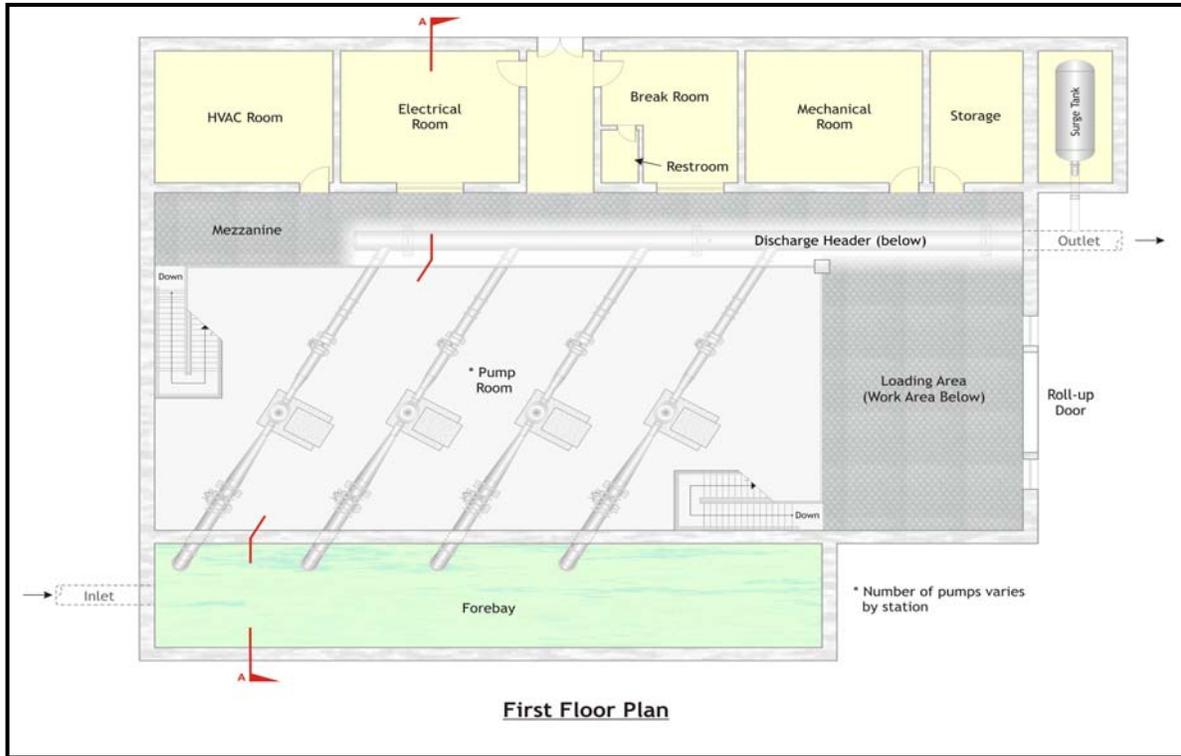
Pumping Station Layout, Conceptual Floor Plan
